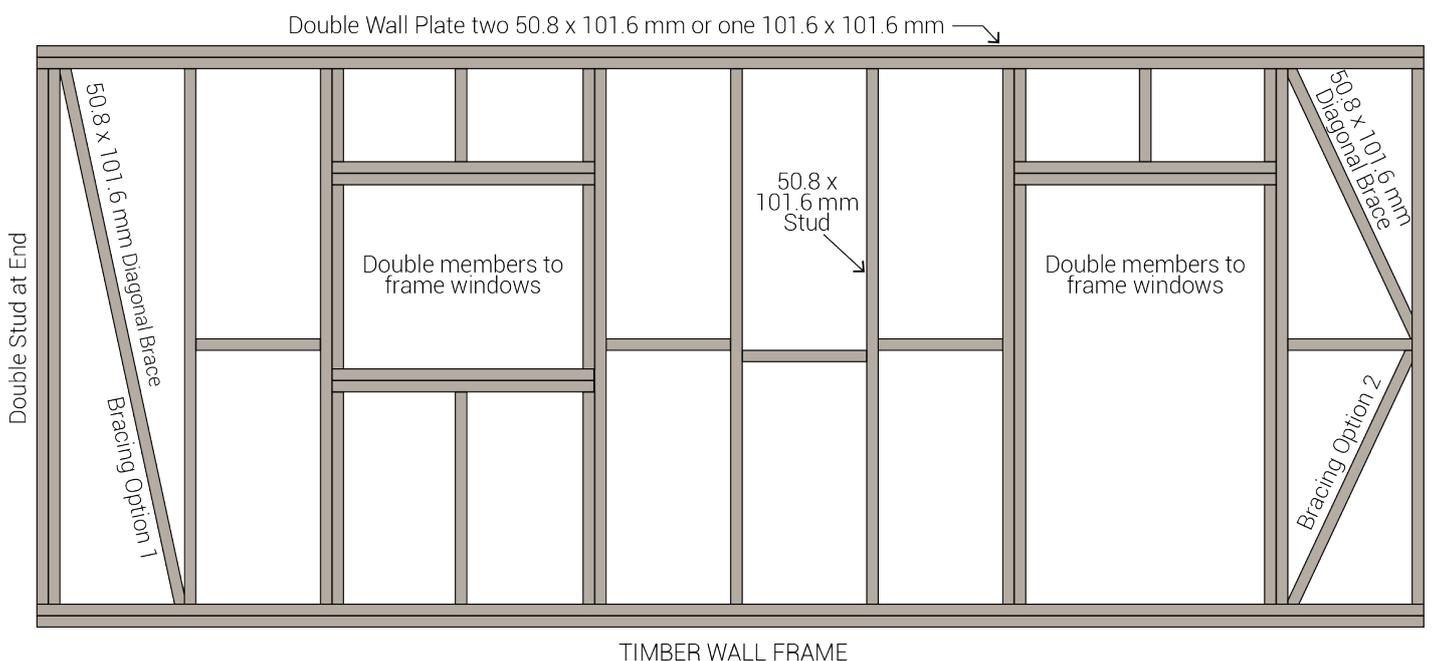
Timber wall frame. Own elaboration based on: UNDP; Engineers Without Borders, (2018).
